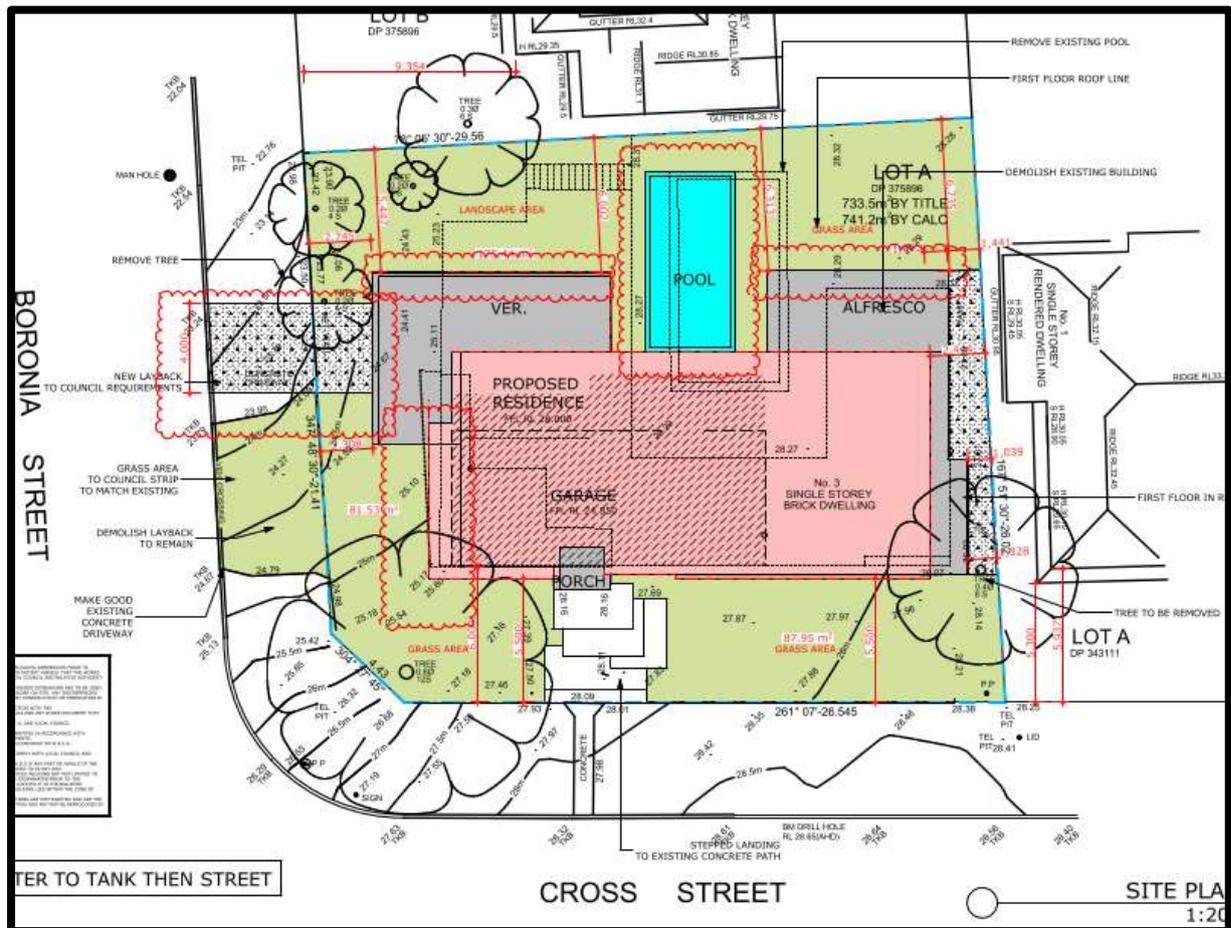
Extract of site plan (Source: David Dechiara, 2020).
